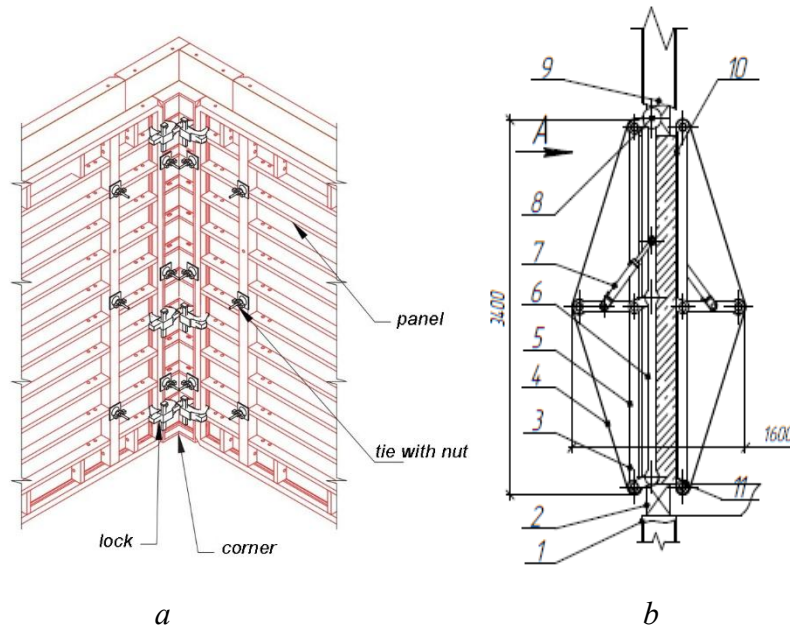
Technological equipment for monolithic concreting: *a* – panel formwork [7] ; *b* – belt-type modular formwork [8]
